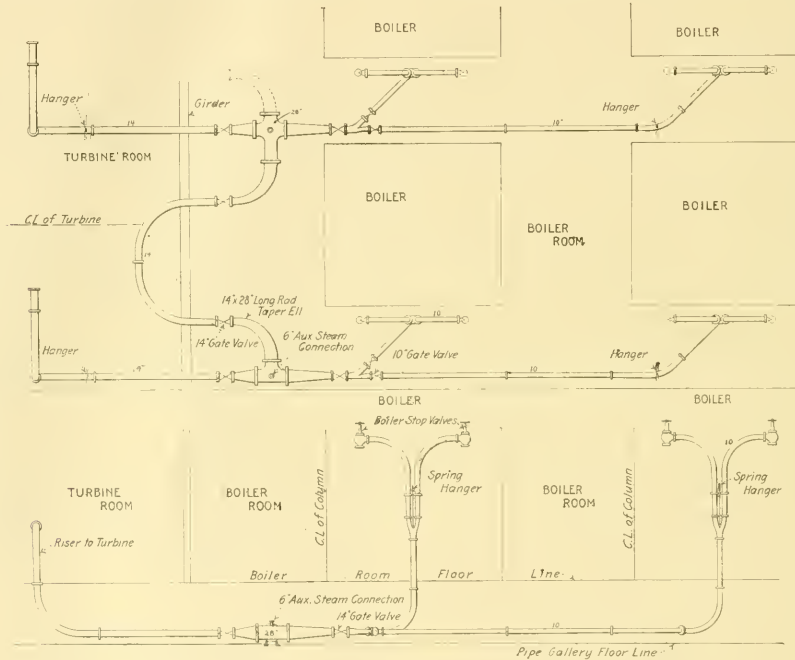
DETAILS OF THE HIGH PRESSURE STEAM PIPING SYSTEM
